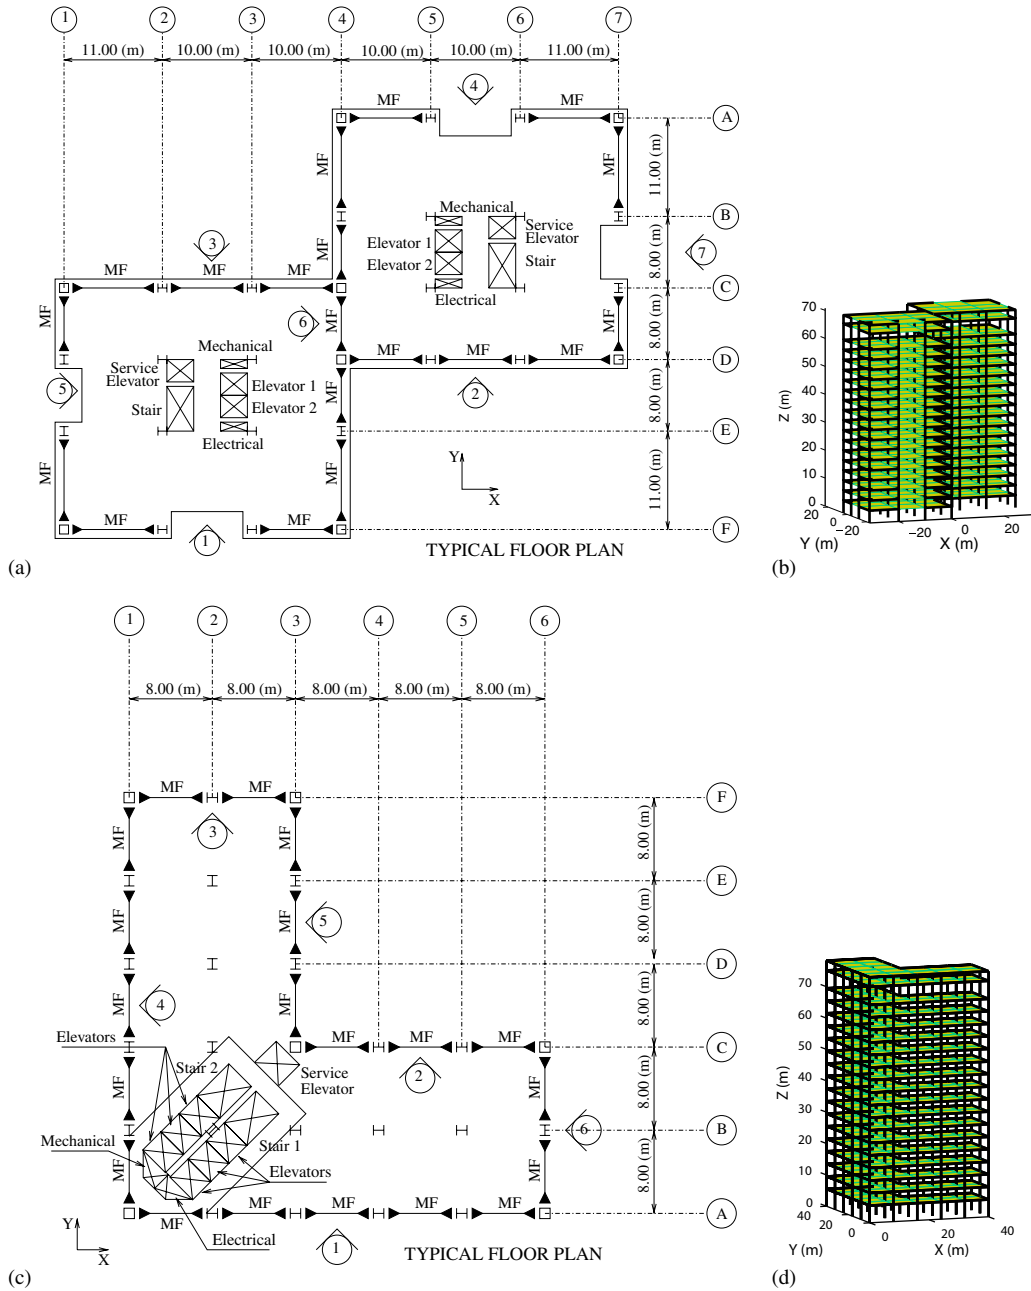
Buildings with reentrant corners: (a) typical floor plan of building B-1; (b) isometric view of building B-1; (c) typical floor plan of buildings B-2 and B-2A; and (d) isometric view of buildings B-2 and B-2A.
